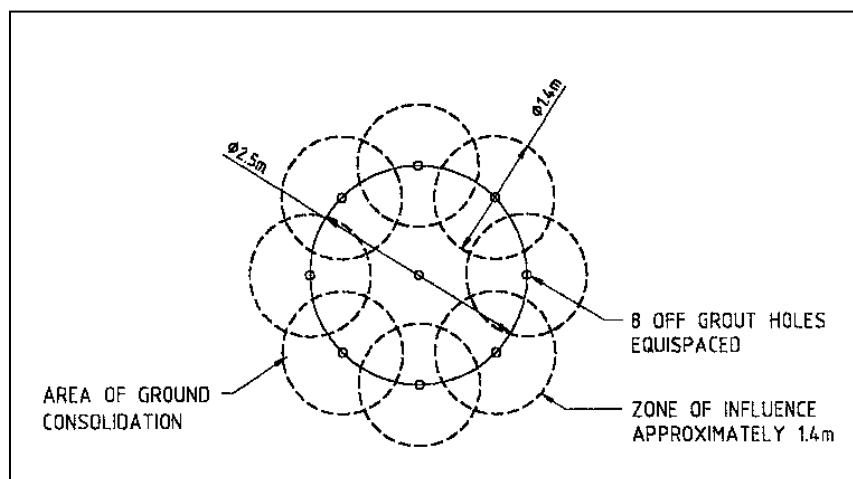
Jet grouting layout at Cannington Mine, Queensland, Australia.
